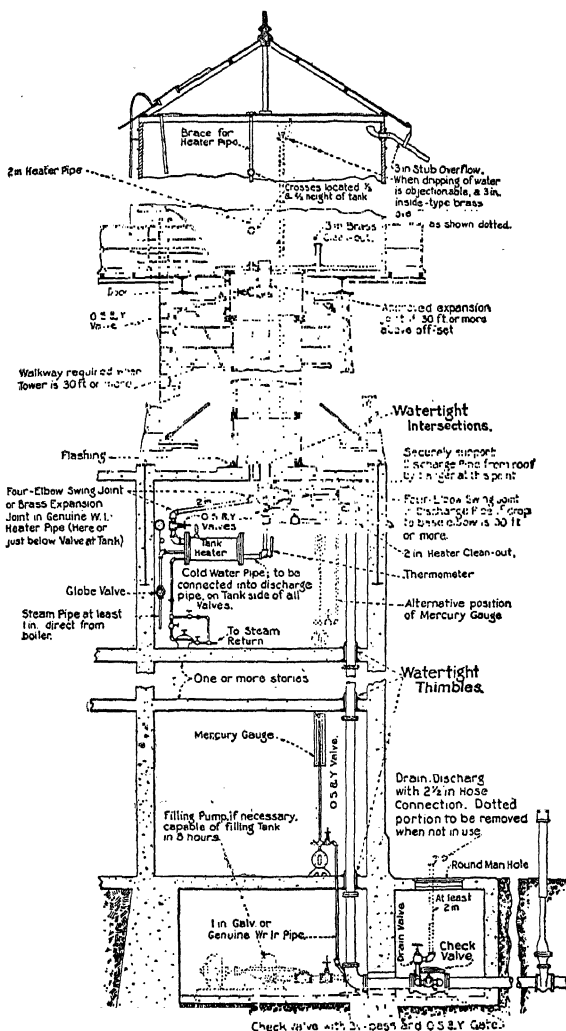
Pipe connections for a gravity storage tank located over a building.
